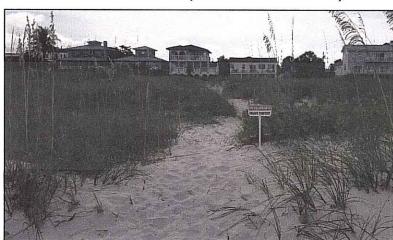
SIGN (SEE SHEET 2 OF 7)
